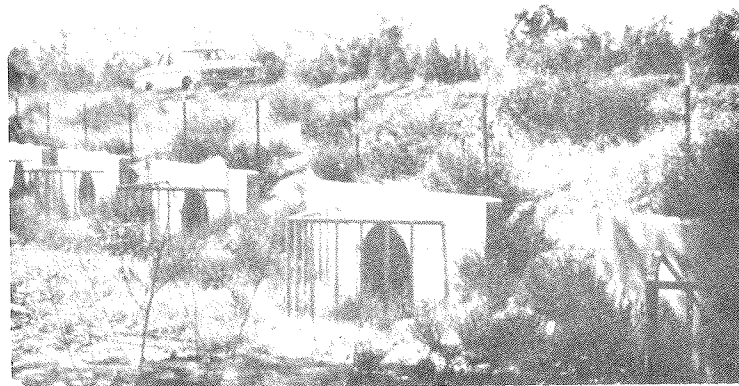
Steel debris deflectors installed at entrances to a battery of culverts.
